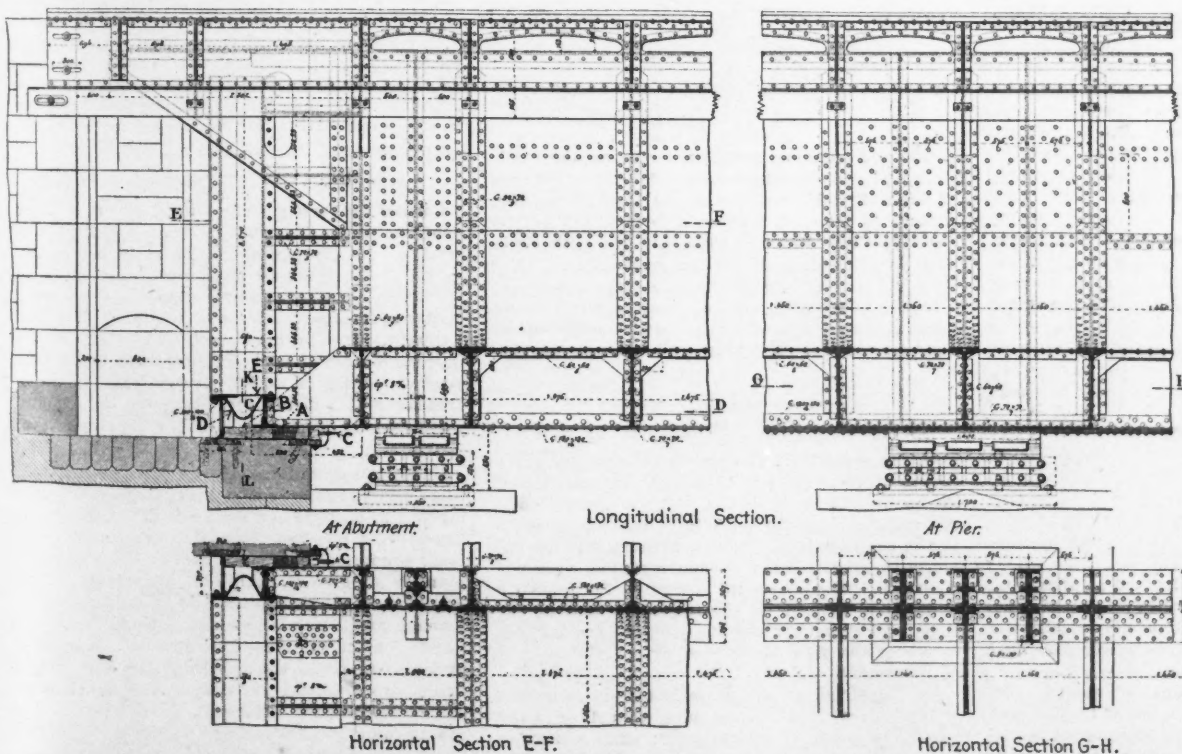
VERTICAL AND HORIZONTAL LONGITUDINAL SECTIONS OF STEEL TROUGH OF BRIARE CANAL AQUEDUCT.
